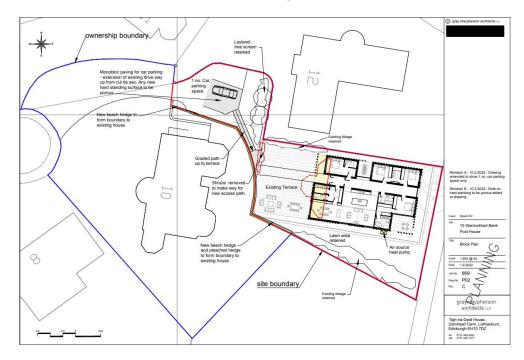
Extract from Proposed Block Plan P02 (Revised) (GMA)
